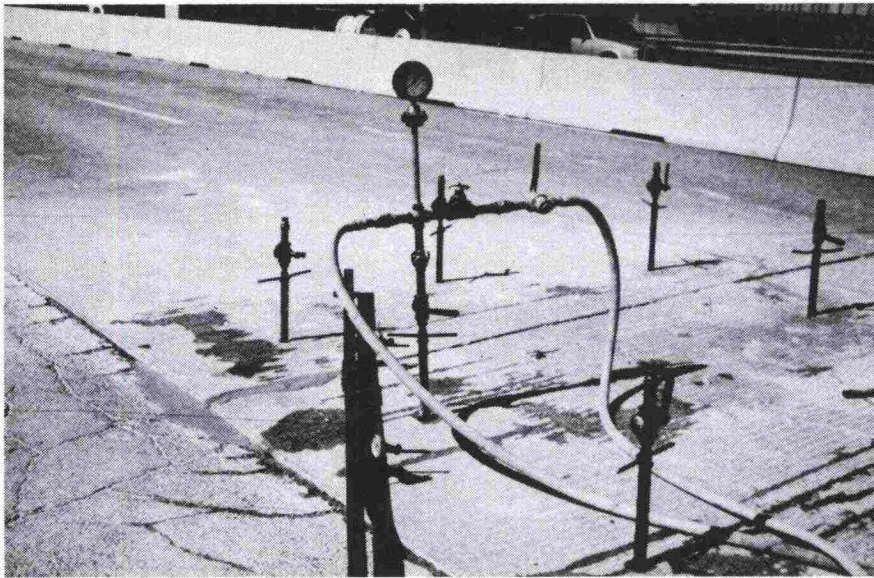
Injection of a rocking slab from underneath /17/
